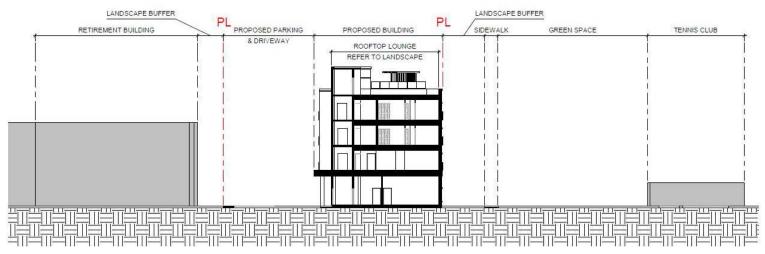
East to West Site Section showing relationship of building to adjacent properties
